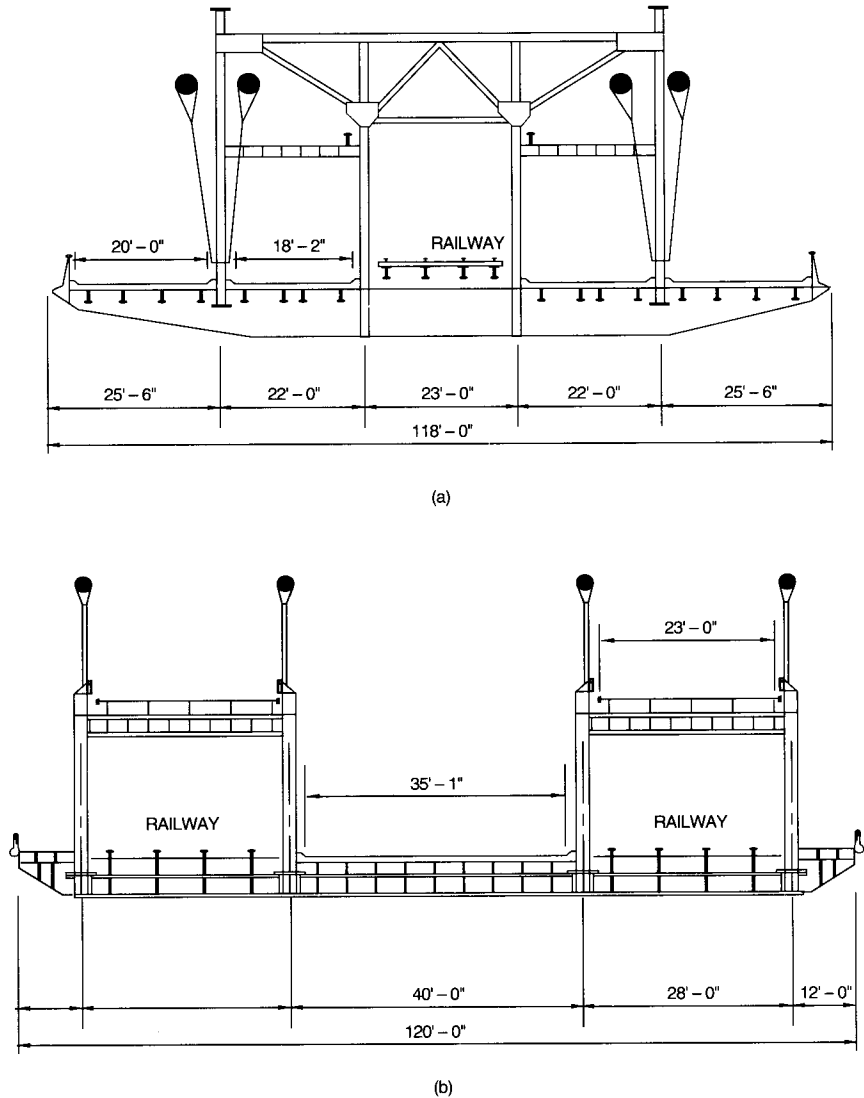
Position of rail loading on two suspension bridges: (a) Williamsburg Bridge and (b) Manhattan Bridge.
